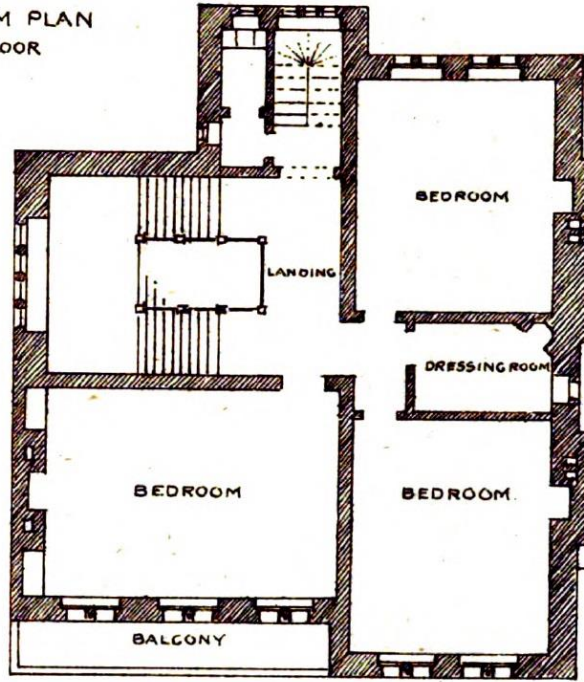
Proposed first-floor plan, published in 1871. (North is to the left)
